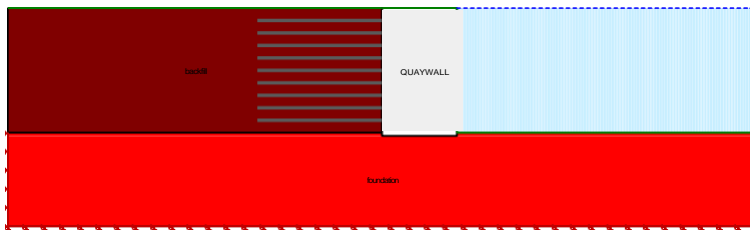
A quay wall model reinforced with backfill soil only (Case B)
